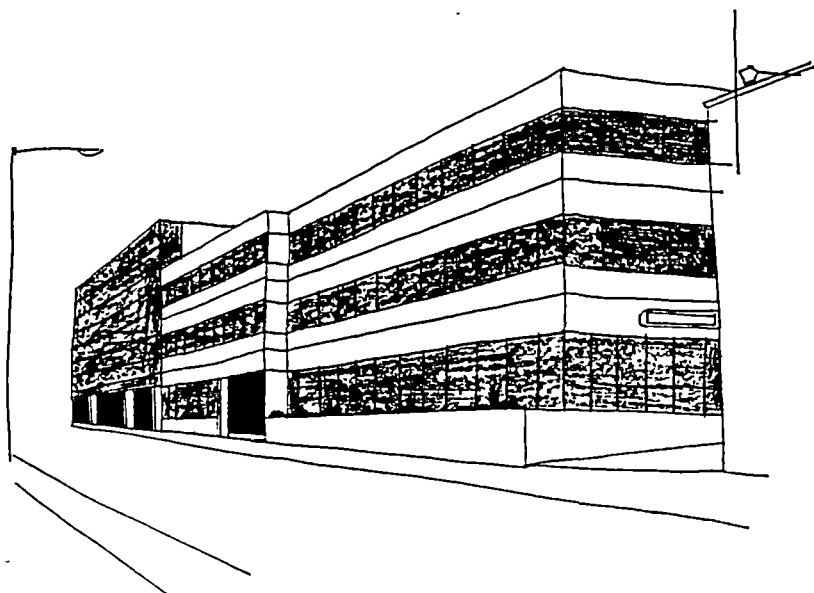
C.E.S./A.B.S. Building 175 Collins Street
